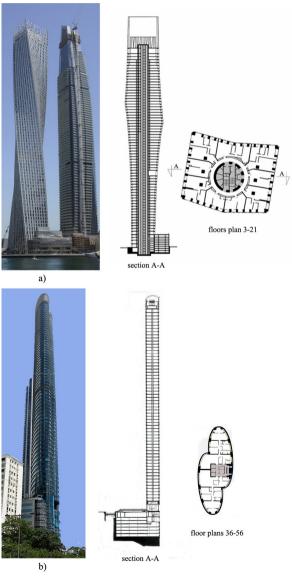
Aerodynamic changing of plan geometry of residential buildings: a) Cayan Tower (Dubai, UAE); b) HighCliff (Hong Kong, China) (developed by authors)
